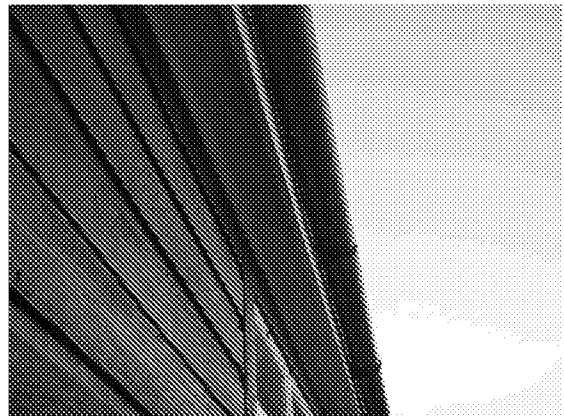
Gaps behind the metallic end caps (north elevation).
